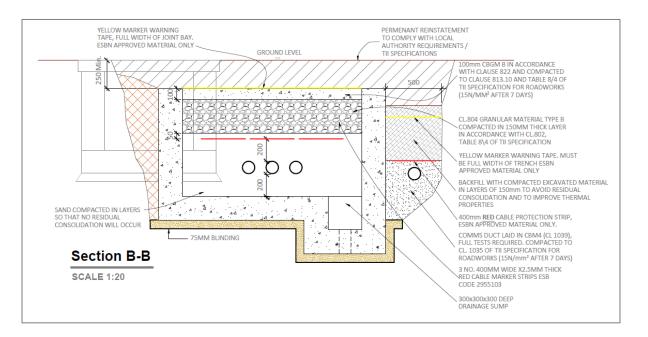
Typical Section Through 38kV Single Circuit Joint Bay
